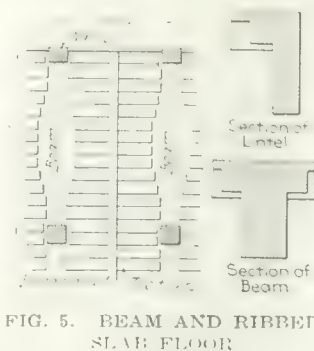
BEAM AND RIBBED SLAB FLOOR
